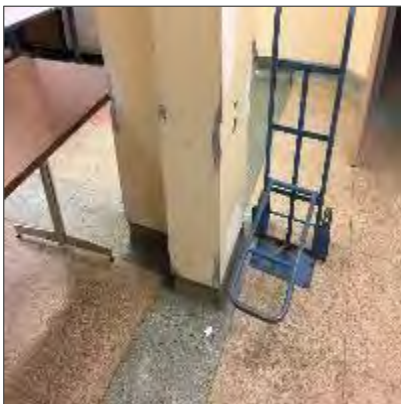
Damaged asbestos-containing drywall joint compound at column corners, Room adjacent to Margaret Charter's Auditorium, Basement.
